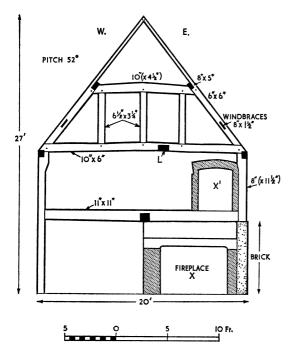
Wellshead Farm, Harwell. Tudor Range; Section through Truss 2.
